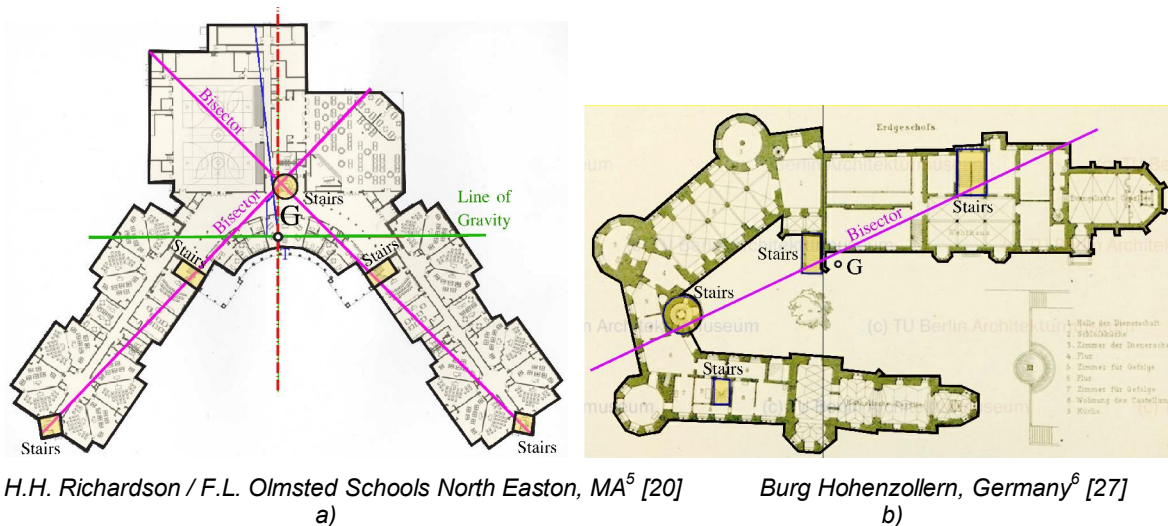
Examples of stairs organized along the area bisectors in the buildings with a) (almost) symmetrical and b) asymmetrical floor plan polygon
